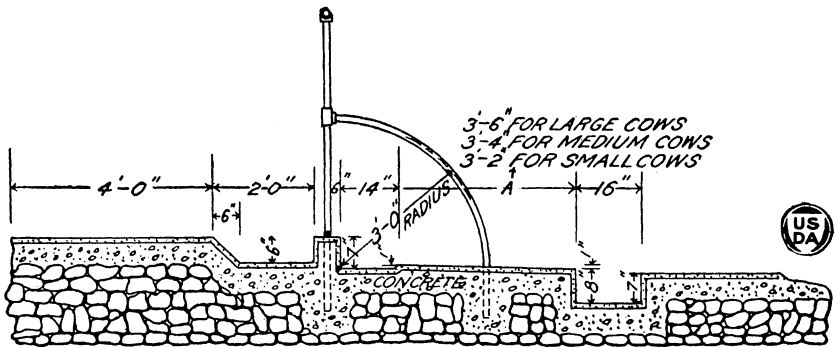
Longitudinal section of cow stall with concrete floor.
